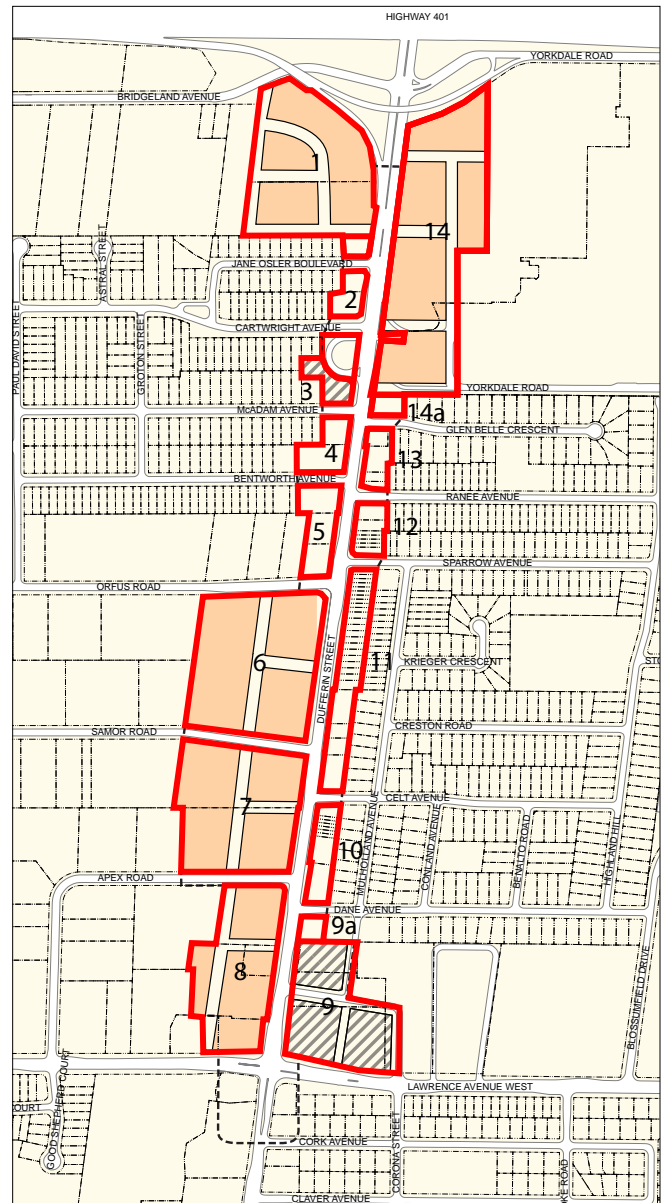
Larger Blocks in the Dufferin Street Secondary Plan Area (in orange)
